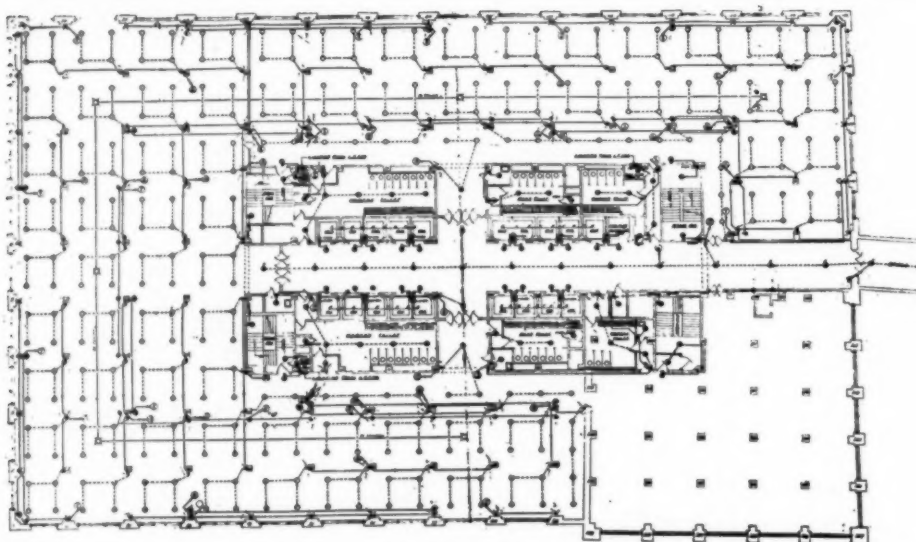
According to this typical lighting plan, bays, which contain 360 sq. ft. of floor space, have four ceiling outlets of 150 watts each
